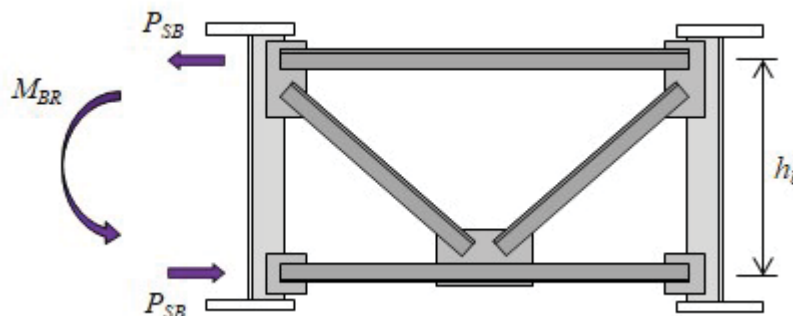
Schematic demonstrating the development of stability bracing forces in cross-frames
